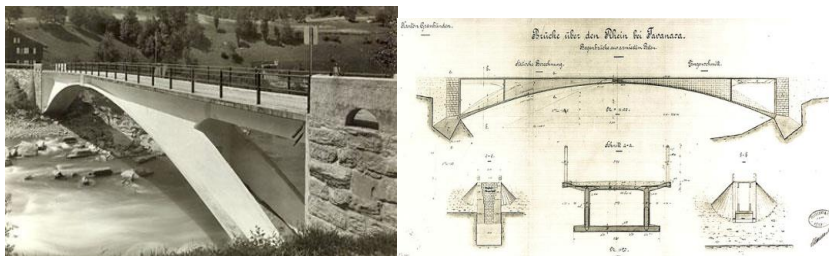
Tavanasa Bridge view and drawing of Maillart design (Caprez, 2018)
